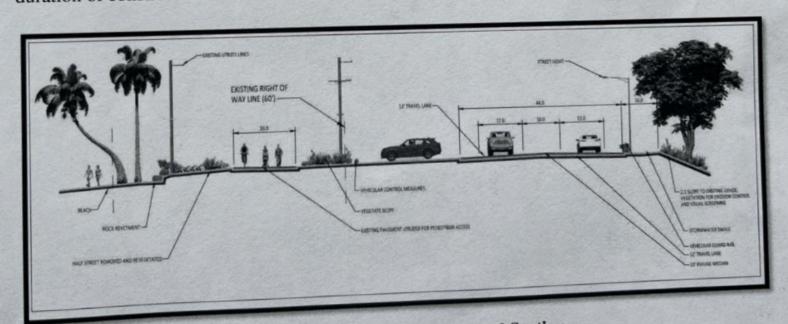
Pedestrian Shift Alternative Alignment Typical Section
